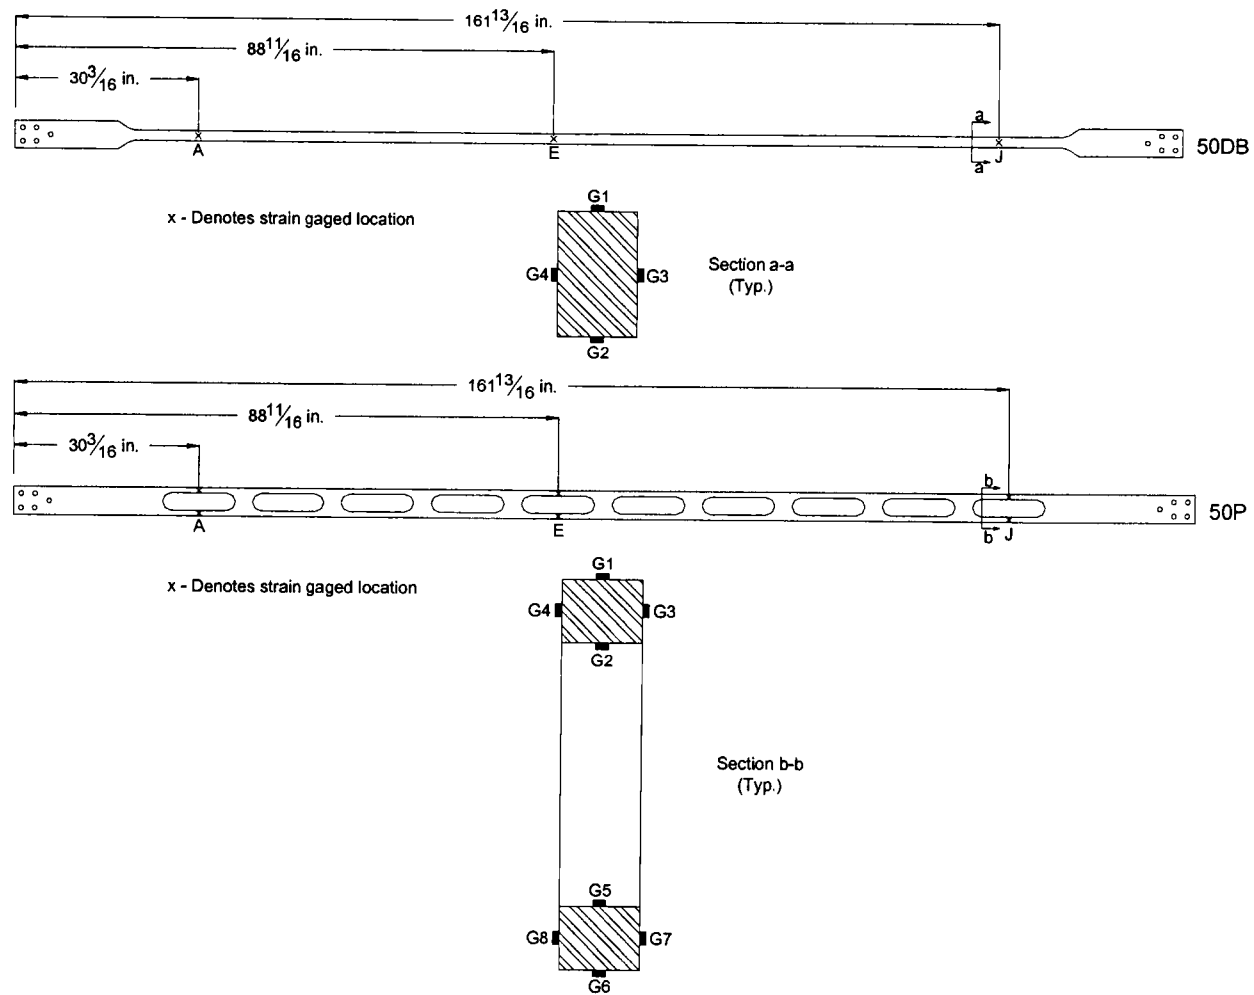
Yielding core strain gage configuration used on 50 kip specimens.
